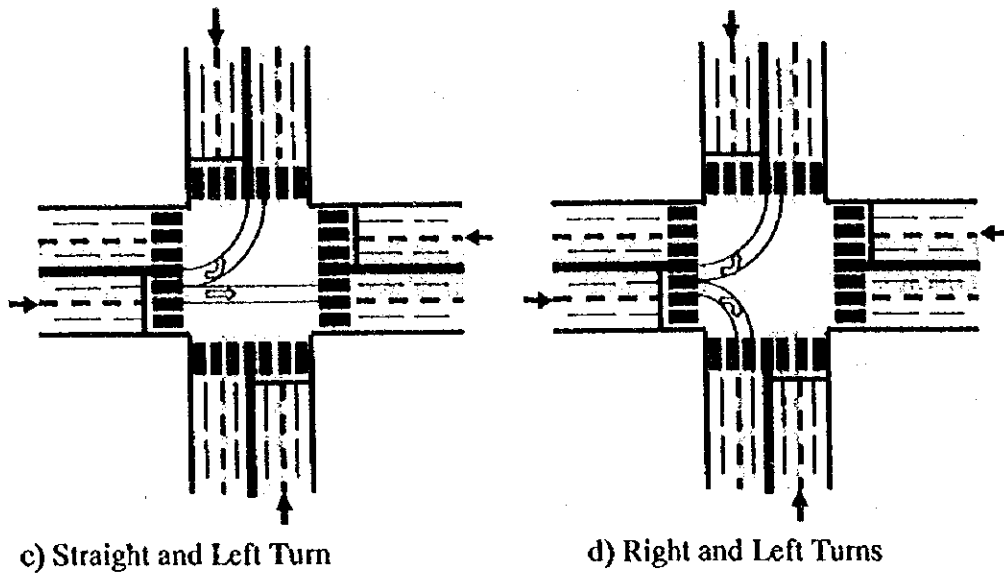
(2) Intersection Layout of Trunk Busway
